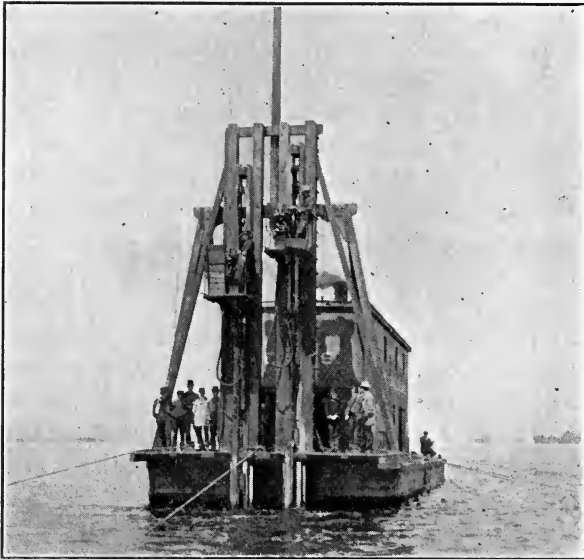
Drill boat equipped with two drill frames. (Courtesy of Ingersoll-Rand Co.)
